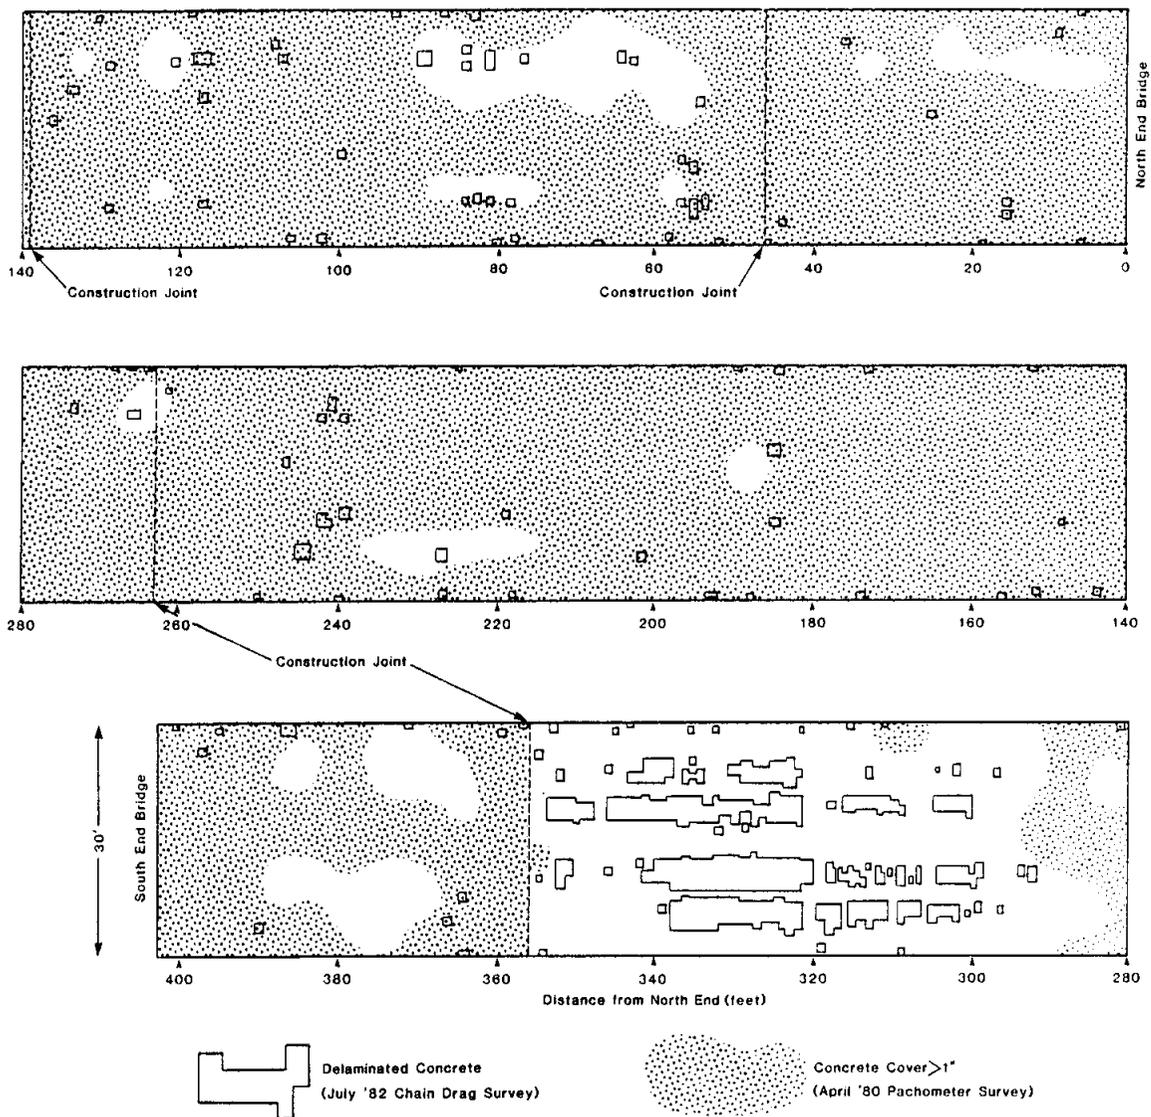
Concrete Cover Depth and Delaminations, Wendell Street Bridge
